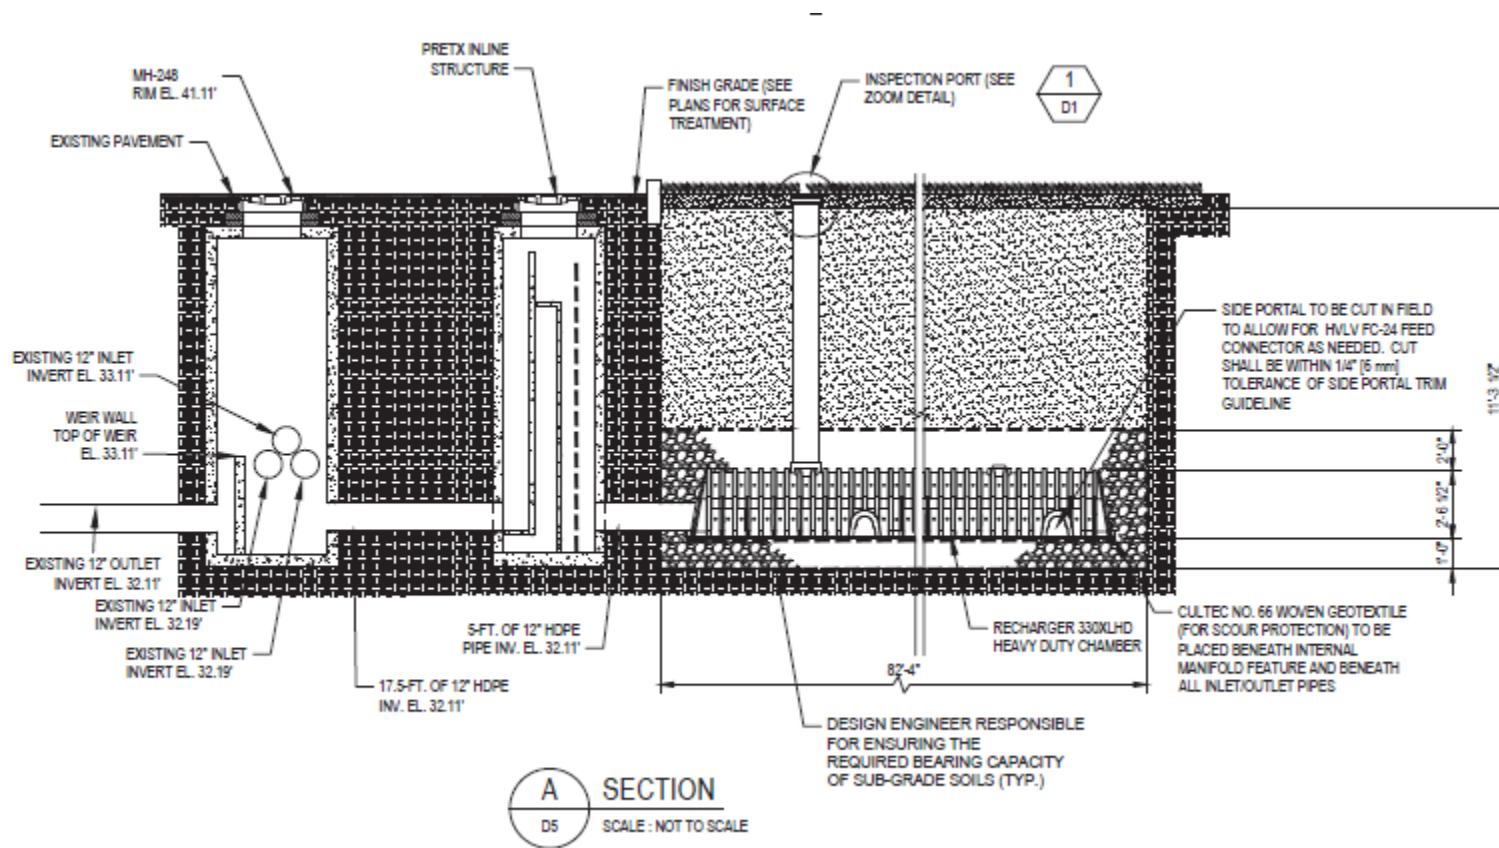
Engineering Section Detail for Subsurface Infiltration System BMP 8
